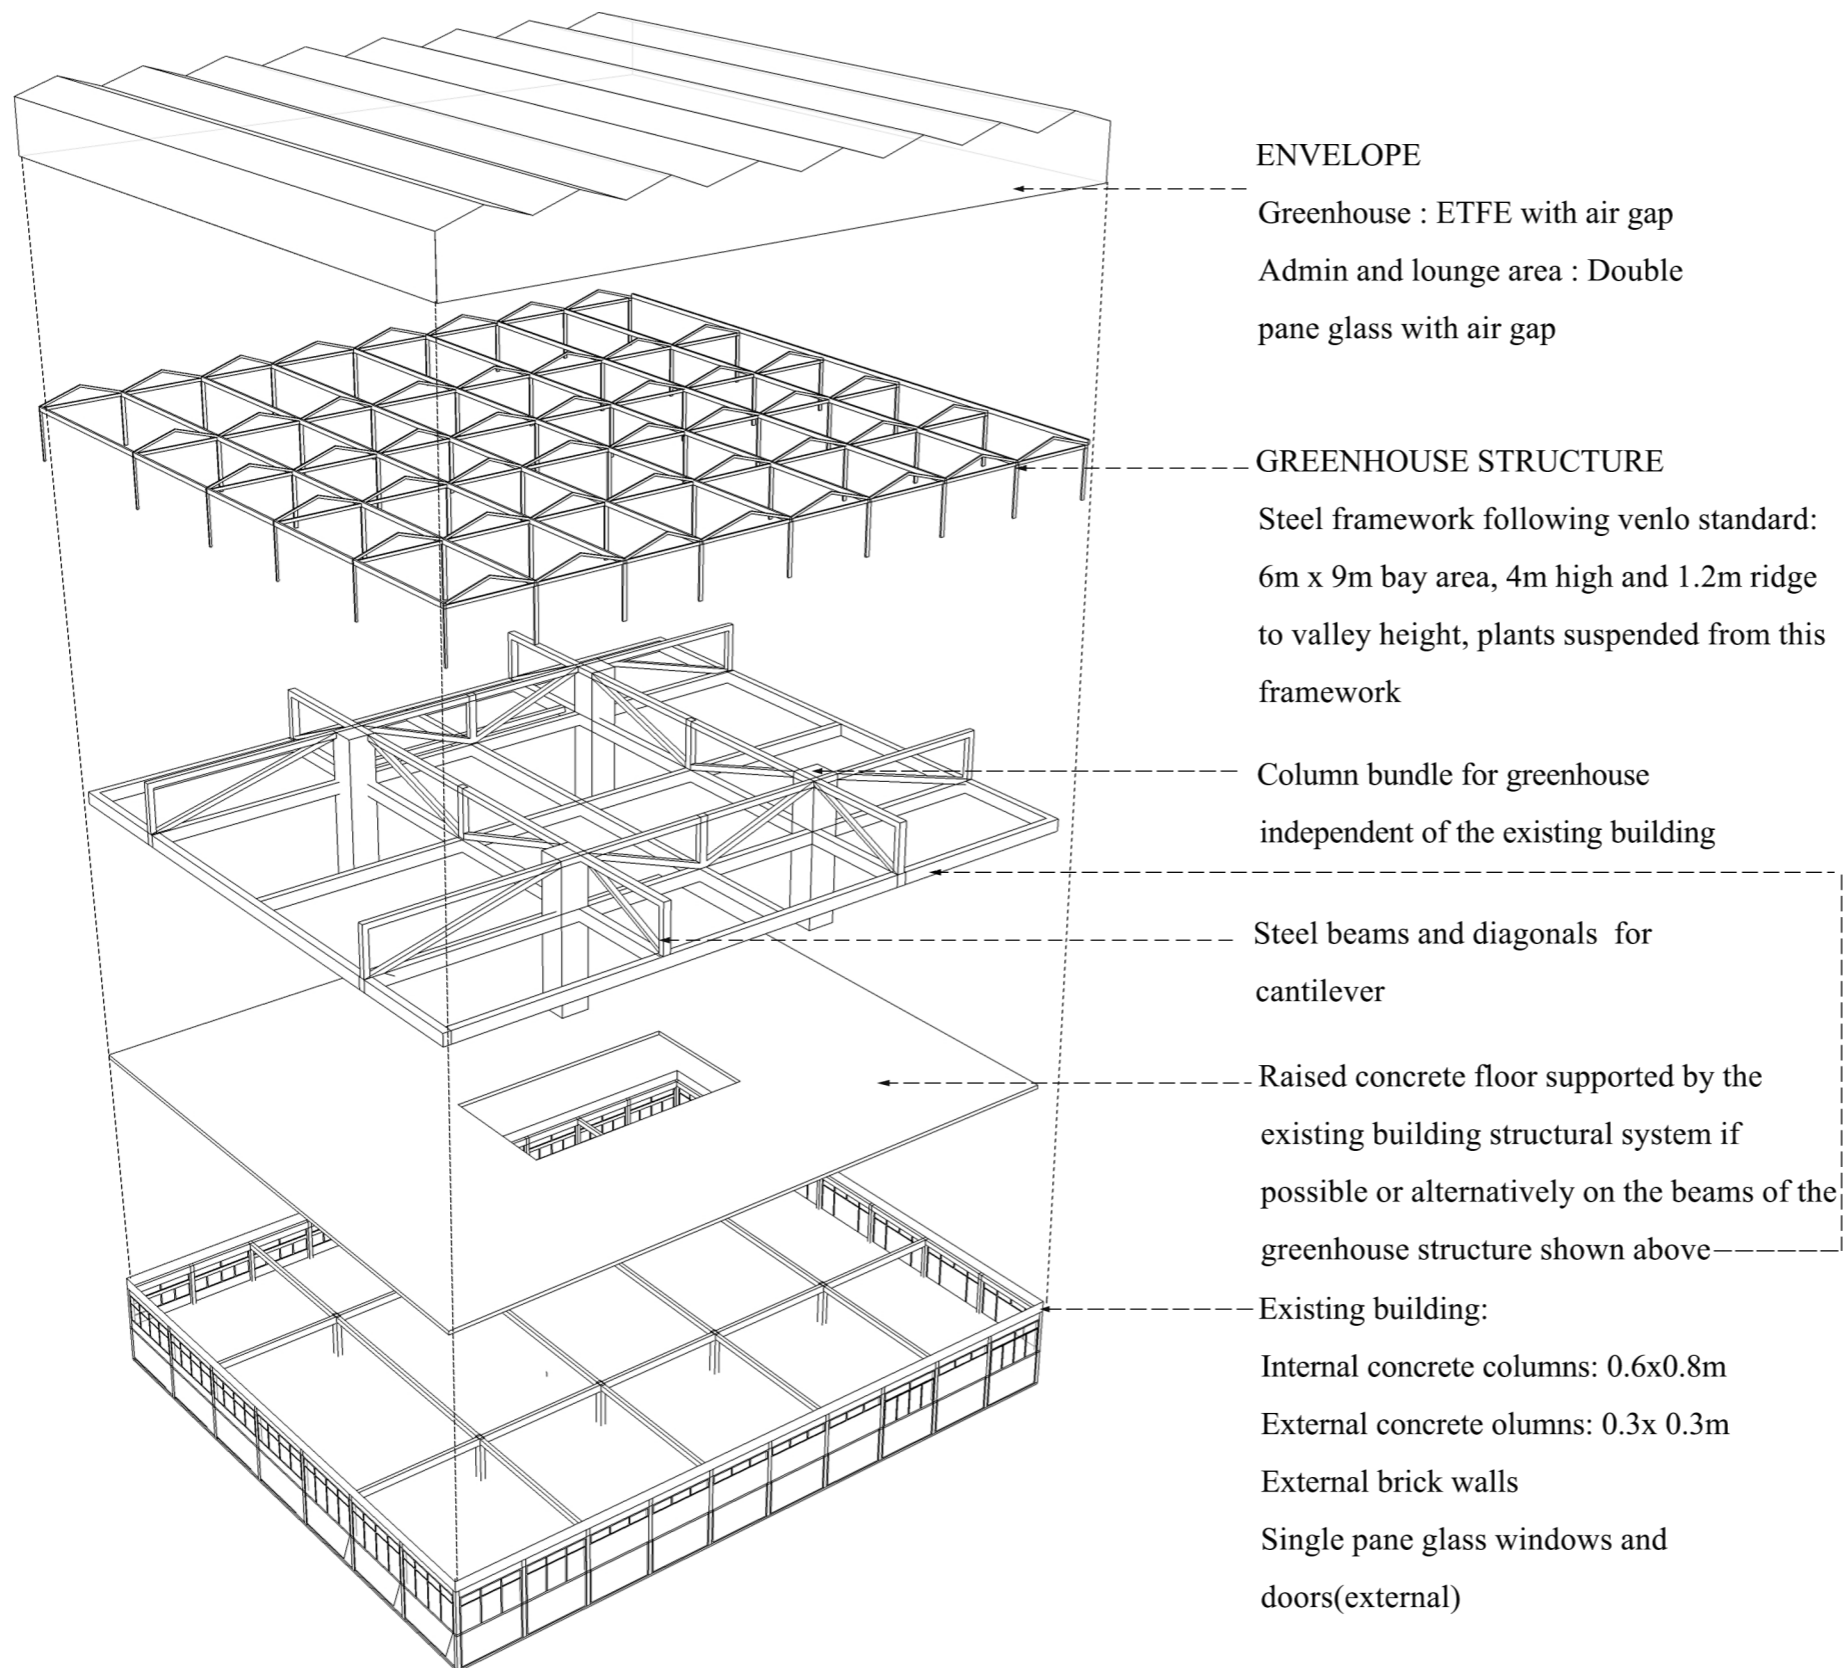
Exploded 3D view of proposed structural system with the existing structure
